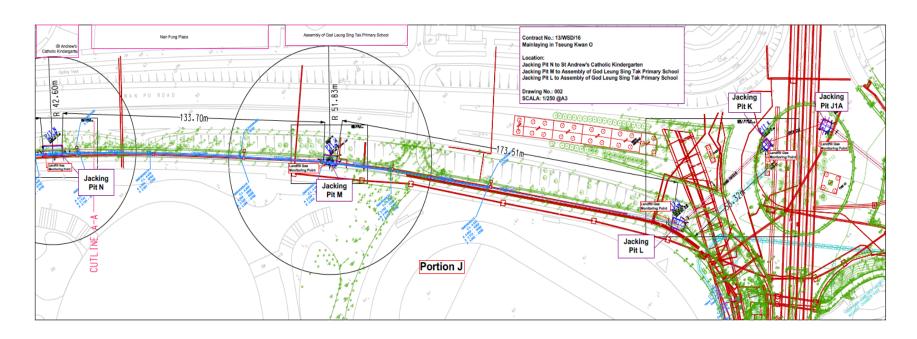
Location Plan for Portion J – Pit L-M-N, J1A, K
